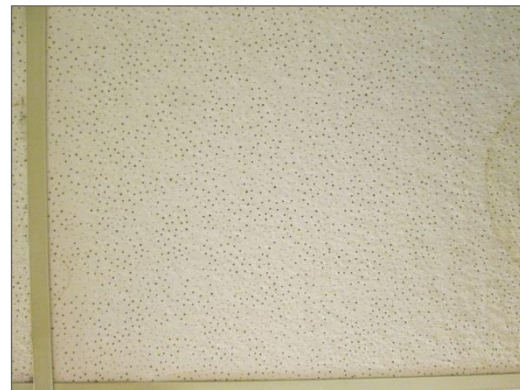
Non-asbestos 24" x 48", lay-in, pinhole and swirl pattern ceiling tile.
